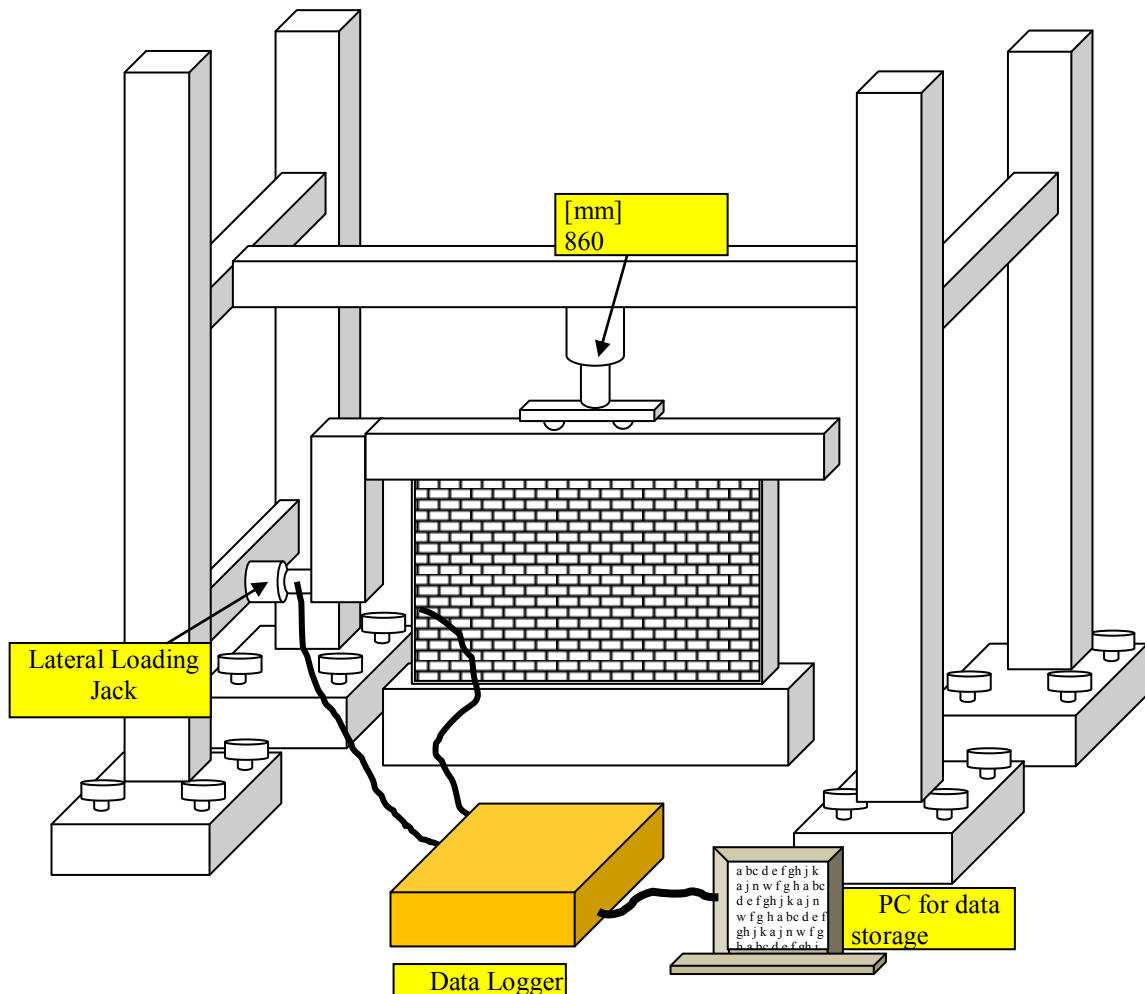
Schematic view of existing facilities in our laboratory for testing shear walls.
